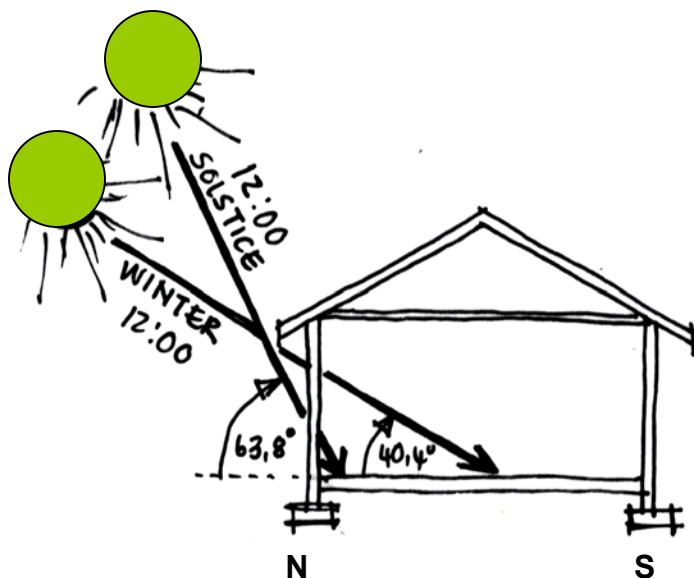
Roof overhang, window height and positioning for Johannesburg.
